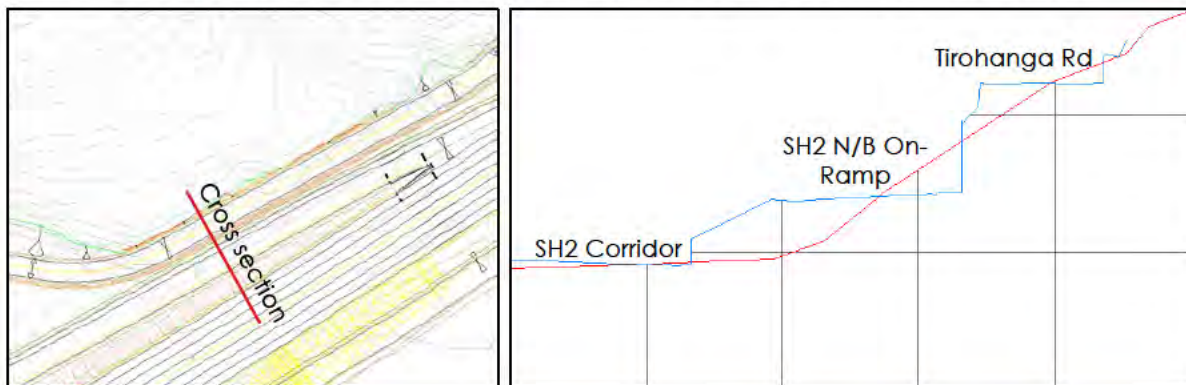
Cascading walls layout and section – northern on-ramp area (grid size is 10m x 10m)
